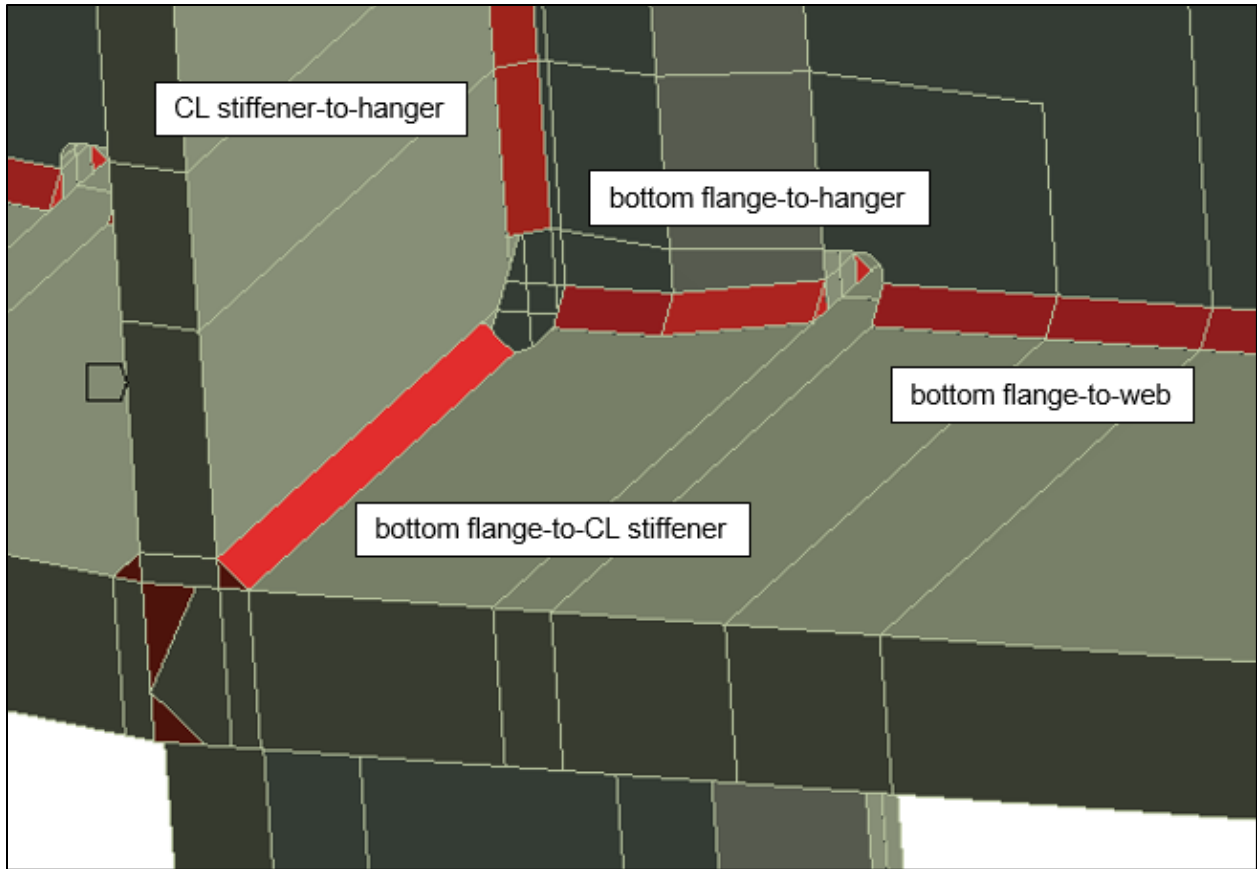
Fillet welds in the region of interest near the weld access holes (3/4 in. leg length).
